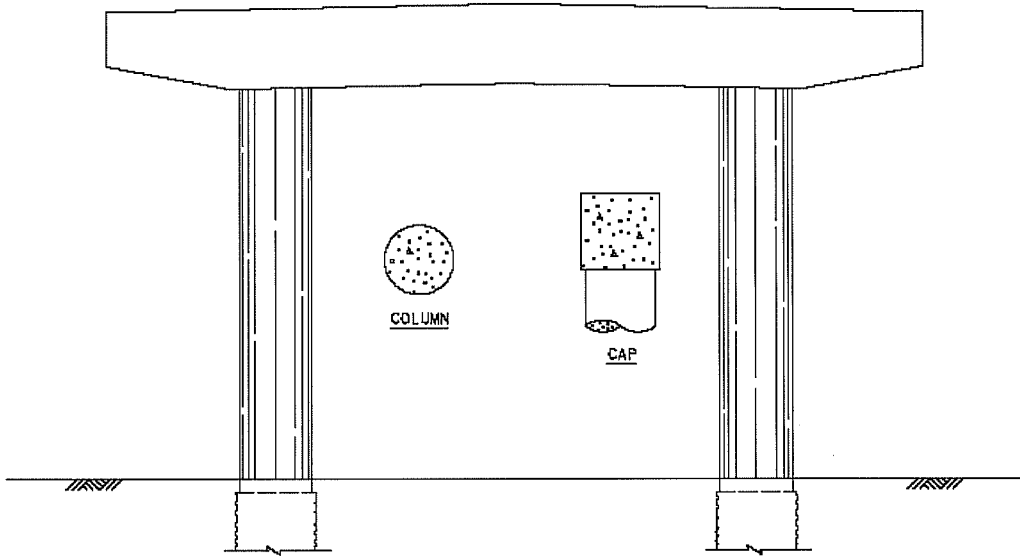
Bridge Pier without Shear Wall (TXDOT, 2001)
